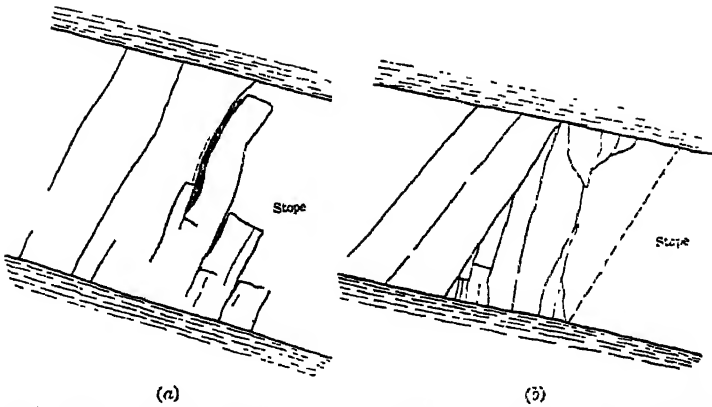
(a) FAILURE OF PILLAR BY DISTORTION AND HEAVE. (b) EXAMPLE OF FAILURE OF PILLAR.
